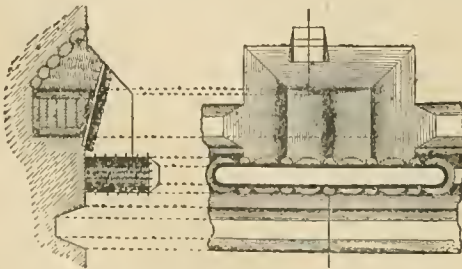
Plan and Section of Magazine behind a Gabion Traverse.
